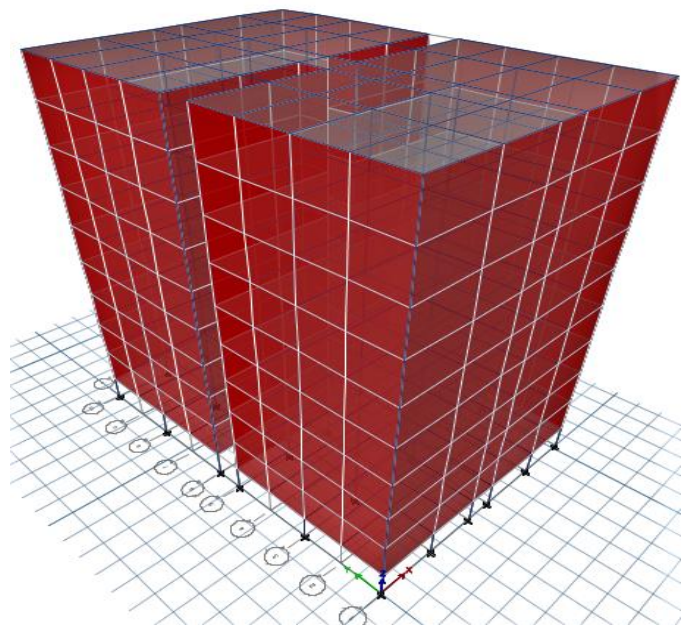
3D view of model3(G+9) multistoried bare frame building without bracing in EN code
